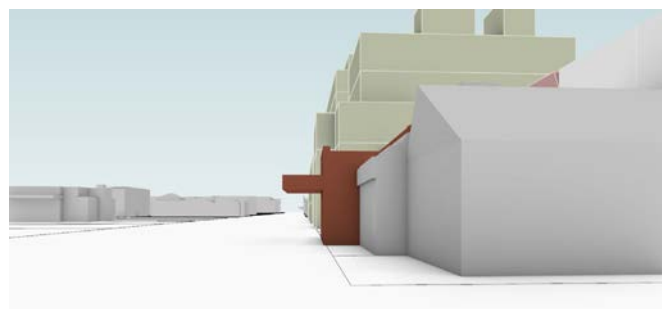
VIEW 4 - Looking west from the northern footpath on Swan Street at the intersection of Queen Street and Swan Street.
